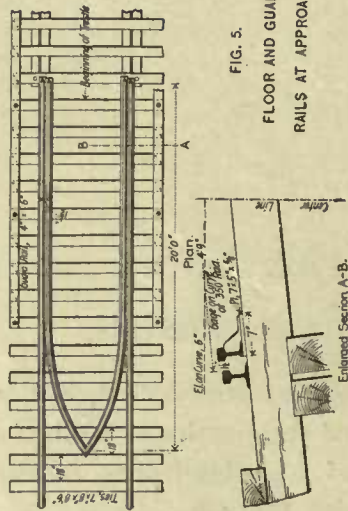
FLOOR AND GUARD RAILS AT APPROACH.
